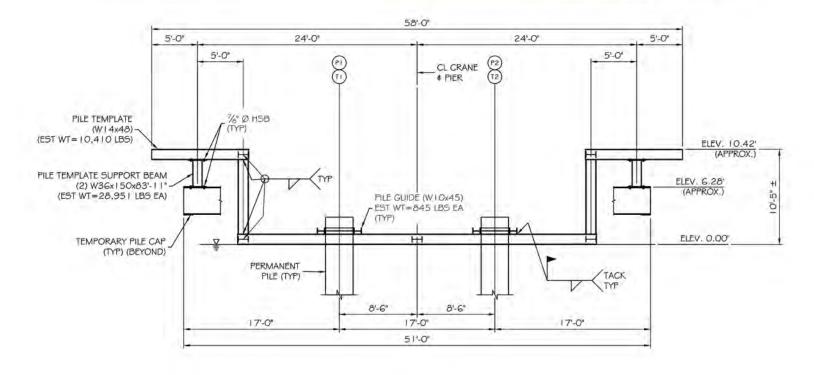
Cross Section showing template for installing piles. Piles are in place for this cross section.
